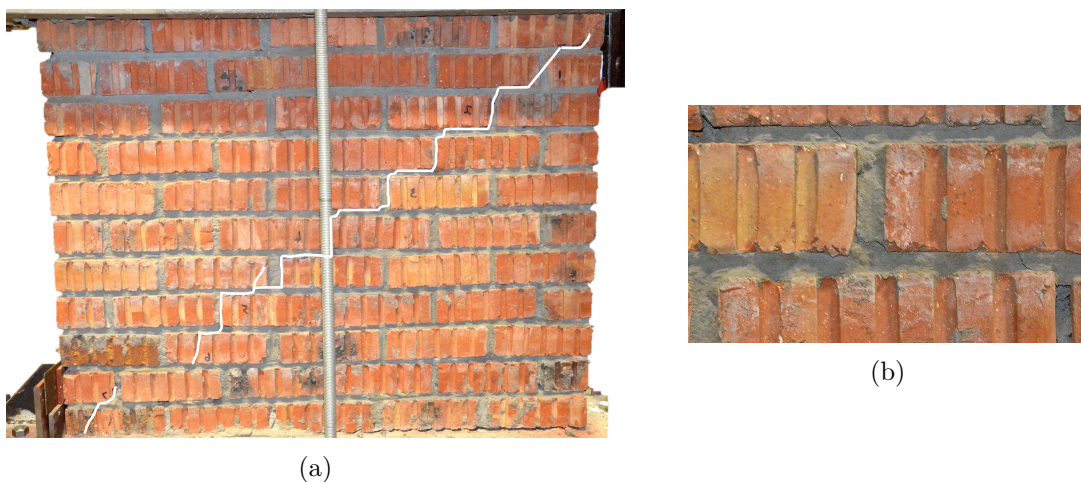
SW-110-30-2 (a) Masonry crack pattern; (b) Focussed on masonry crack initiation.
